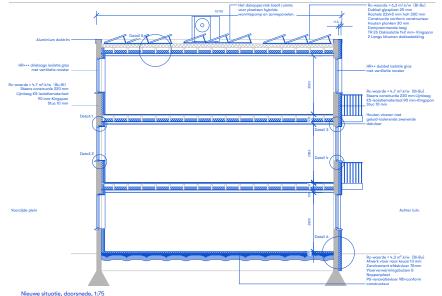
Jongert et al. (2023) section renovation design Superuse Studios
